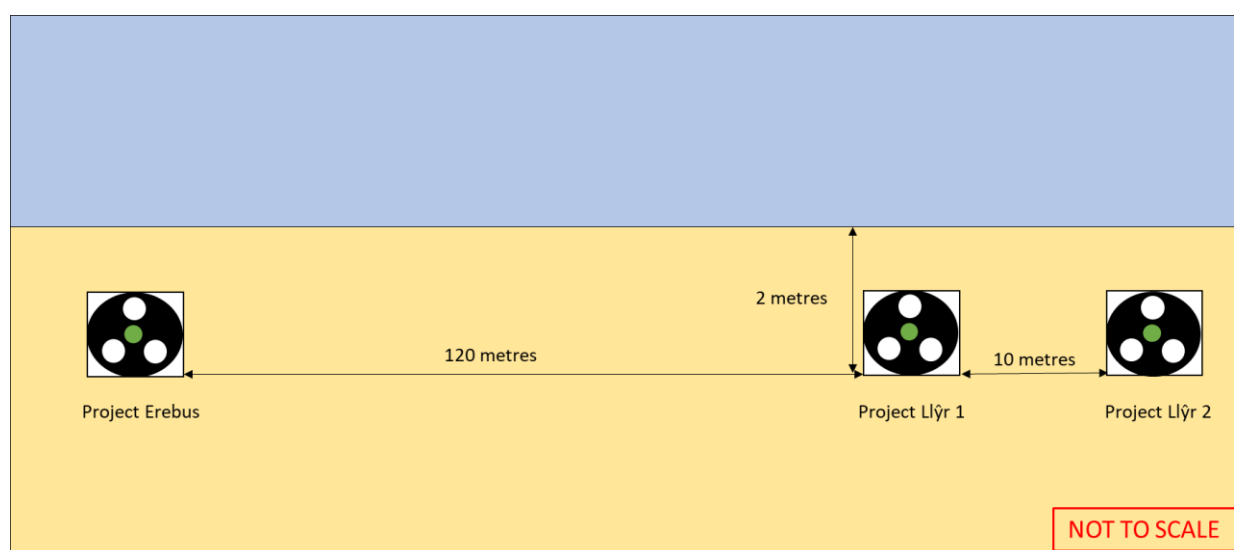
Project Llŷr and Erebus Offshore Export Cable Corridor Arrangement
